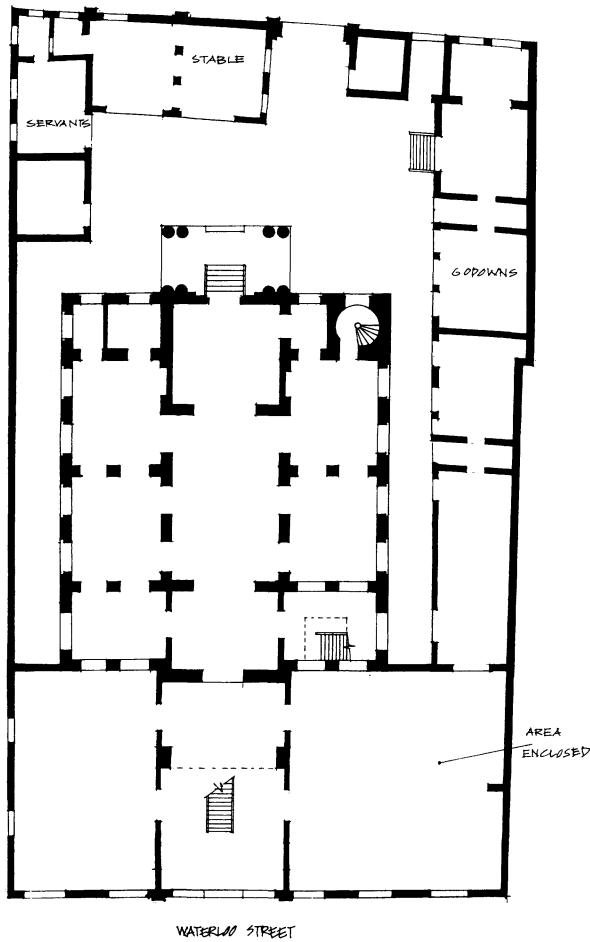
House on 23/24 Waterloo Street, ground floor plan showing first set of changes
